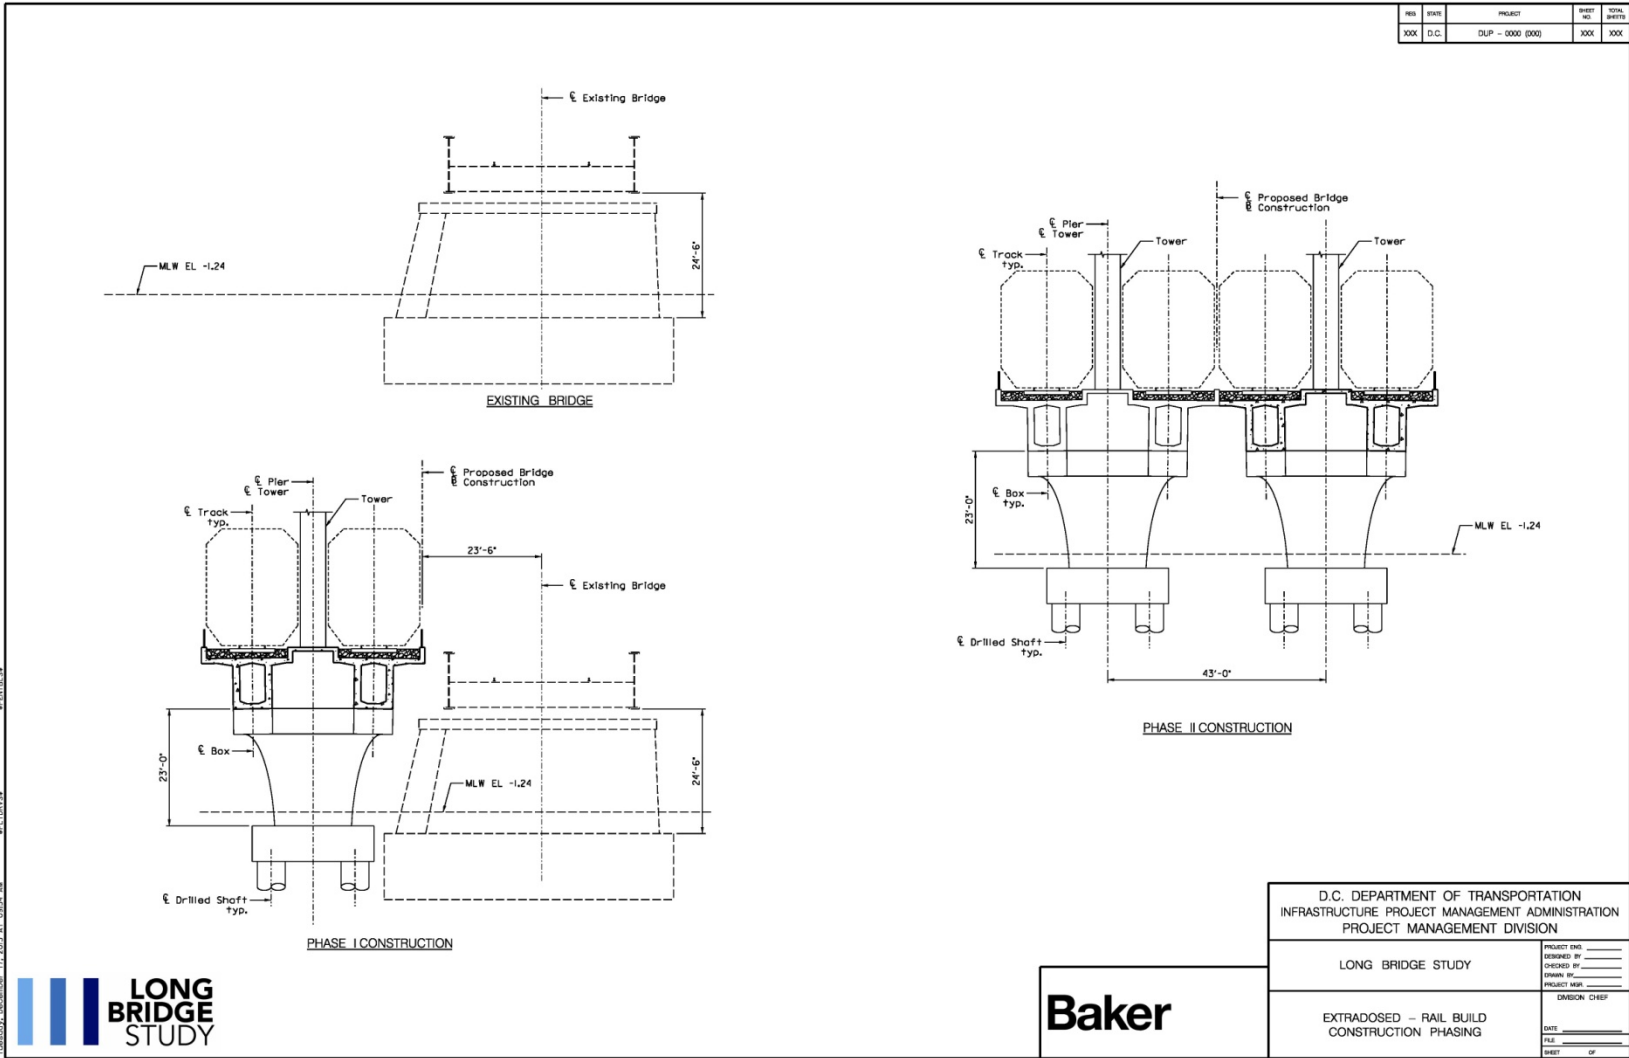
Extradosed / Cable-Stayed Cross Section – Full
